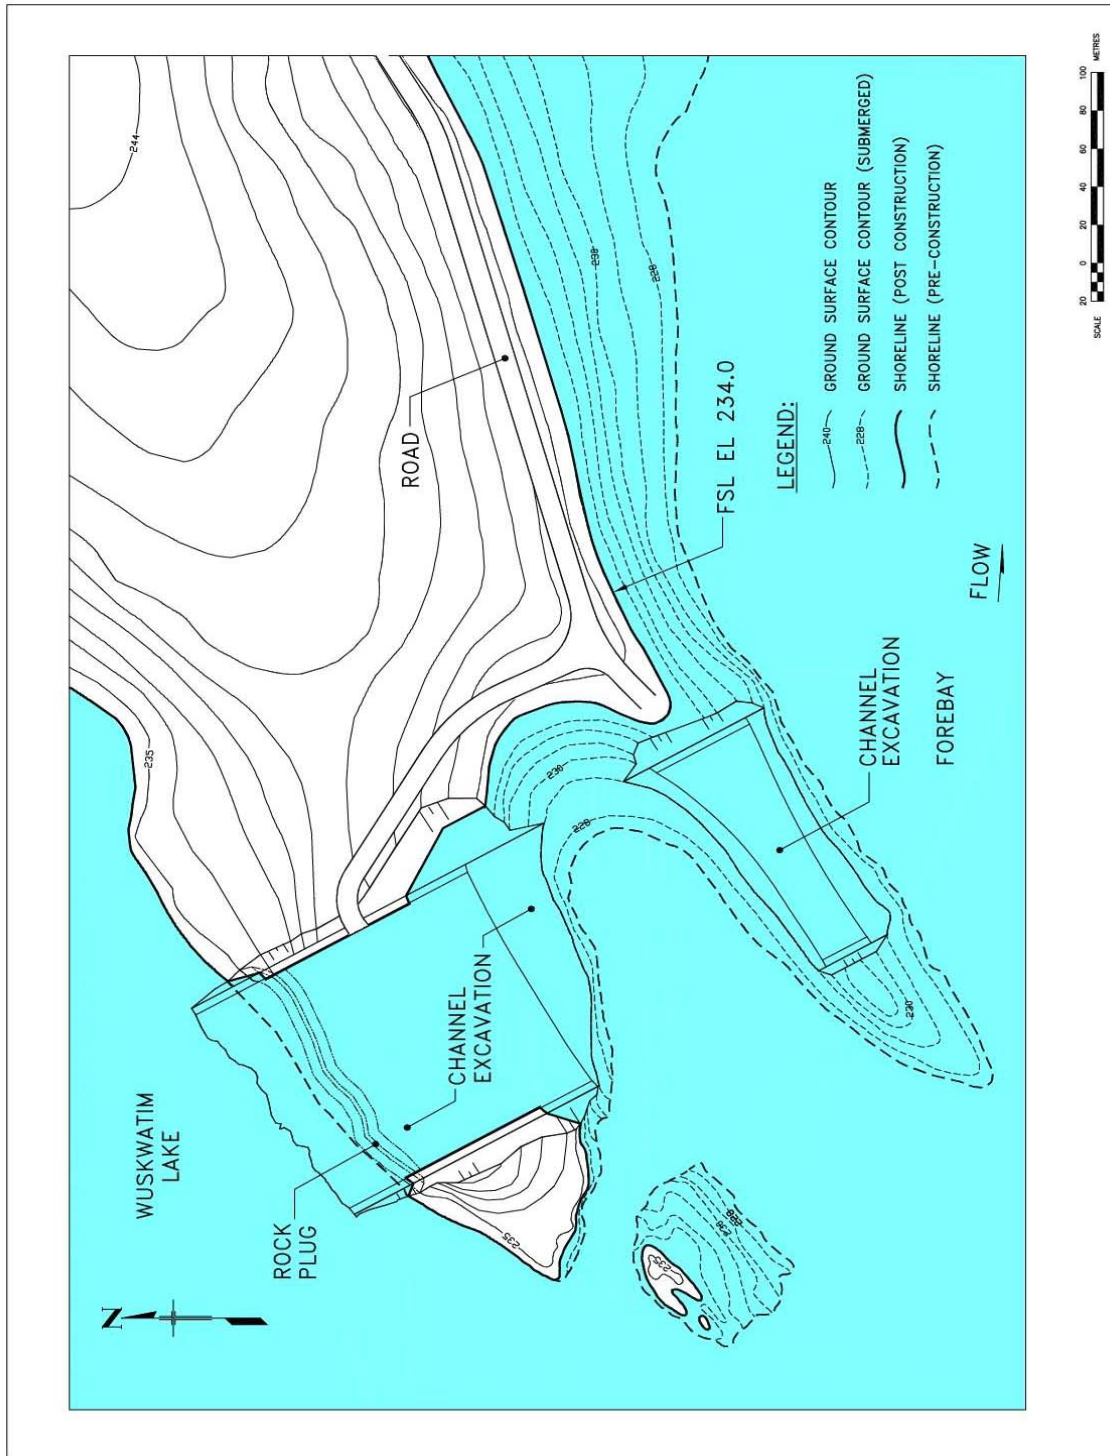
Upstream Channel Excavation Area – Location Plan
